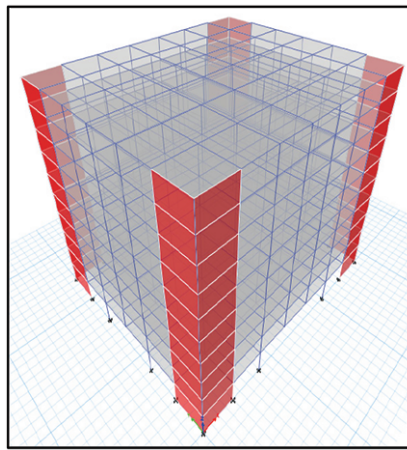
Regular model with floating column and shear wall at Type-2 location – A5
